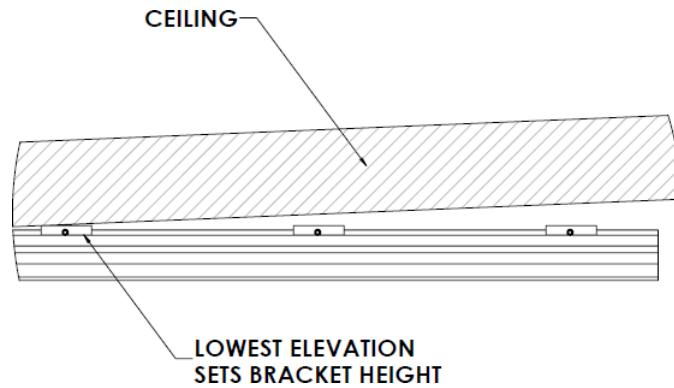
Lowest Elevation Point Where the Ceiling Brackets Will Be Installed
